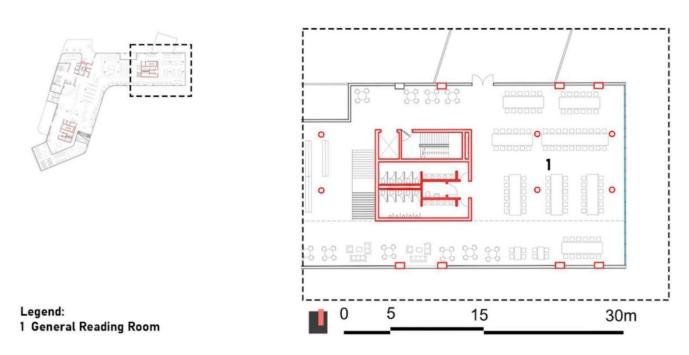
Blowup 3 of Third Floor Plan. Source: Author
